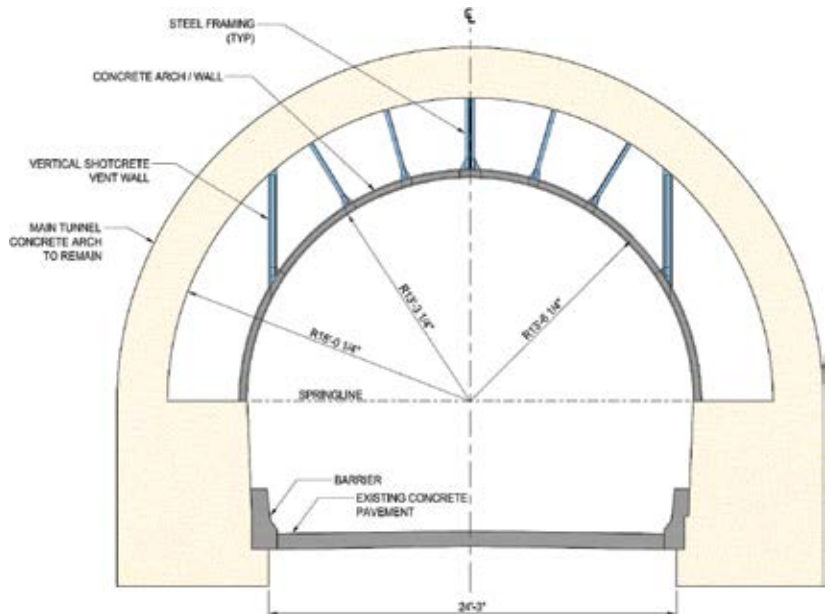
Existing tunnel ventilation arch wall section—cross section
